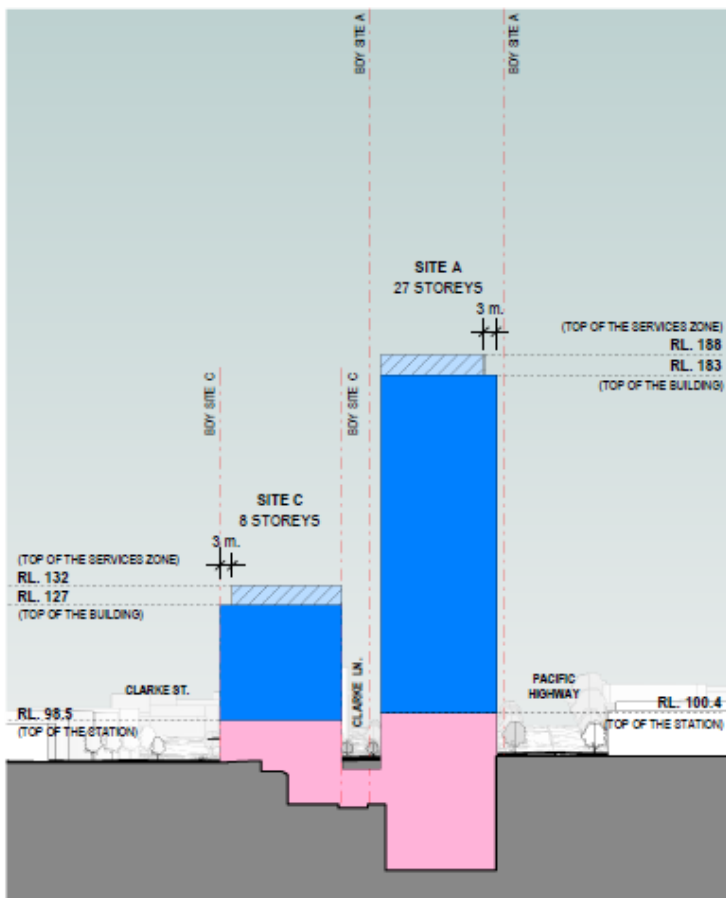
B: Proposed Crows Nest OSD building envelopes – cross section through the site (east-west)
